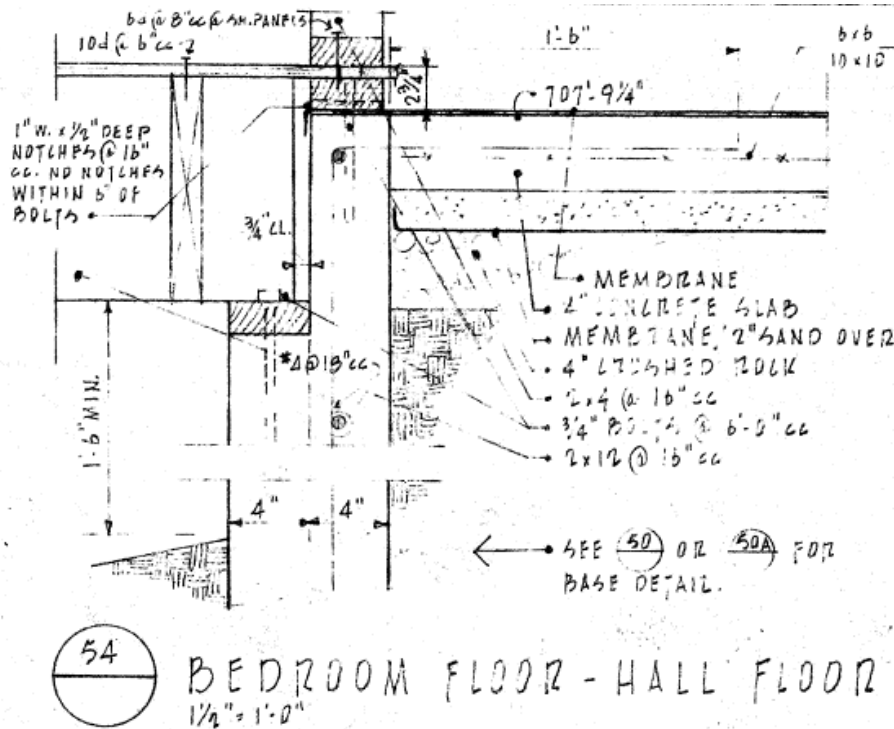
Lower Floor Anchorage to Foundation at South Wall
